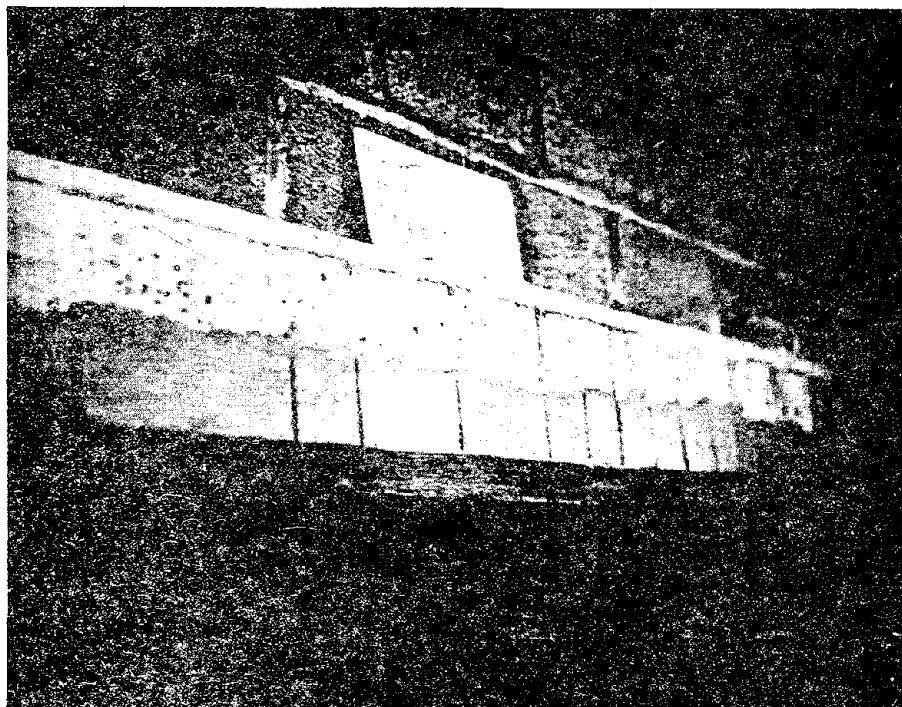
SHOWING REPAIRED CONCRETE FACE. NOTE: DARK COLOR OF REPAIR TURN LIGHT UPON CURING.
